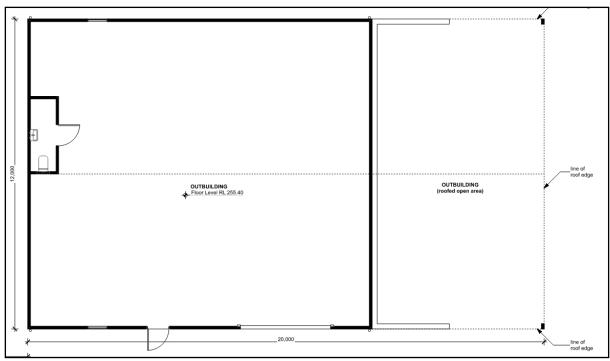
Excerpt of the Outbuilding Floor Plan showing the layout of the building.
